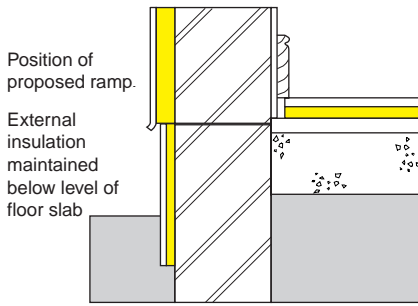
Preventing risk of thermal bridge at adjoining ramps
